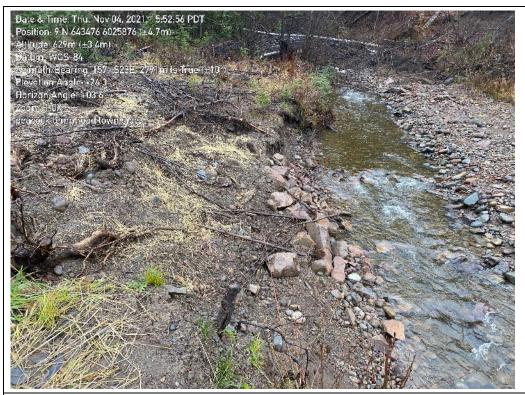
Light application of straw mulch on the town side deactivated temp road.
